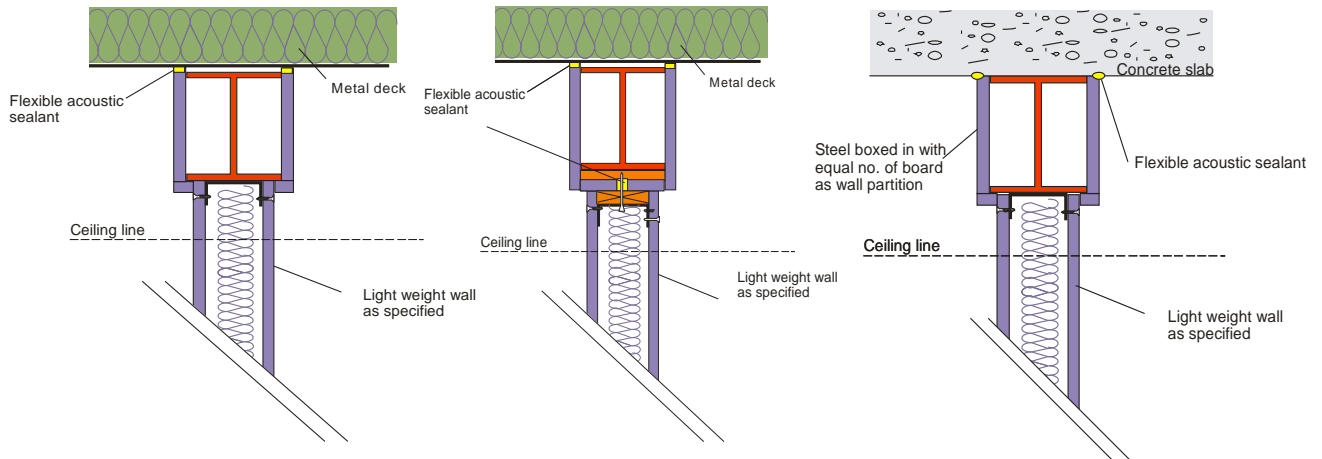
Head details where internal walls are directly below steel beams (section view)
